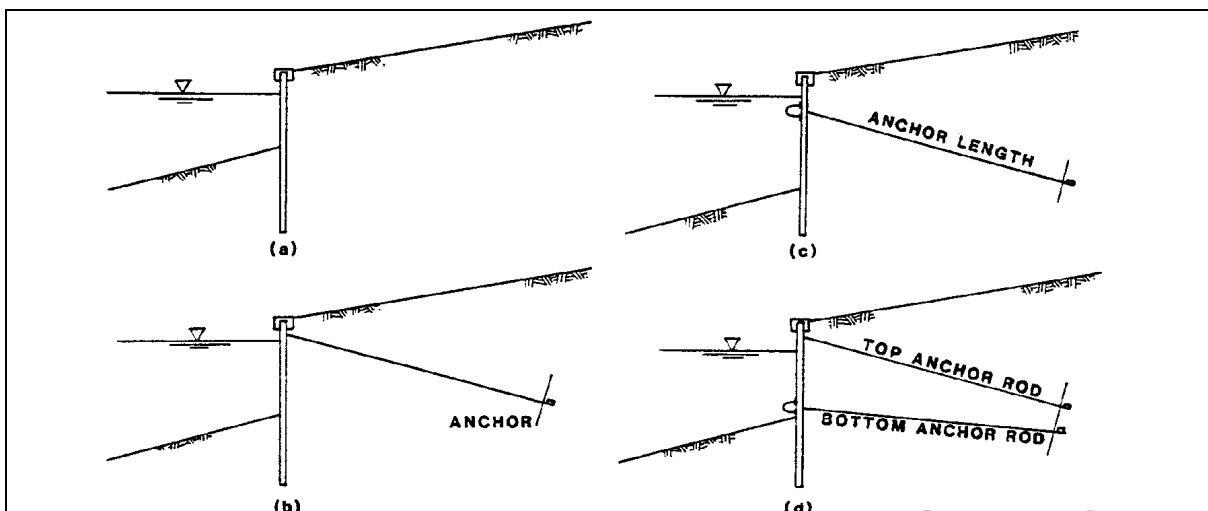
Anchorage schemes for a sheetpile bulkhead (after Brown).⁽²⁾
